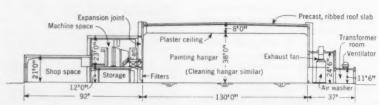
Cross section through hangar shows lean-tos and rigid-frame reinforced-concrete structure. The cleaning section of the hangar is similar to this.
